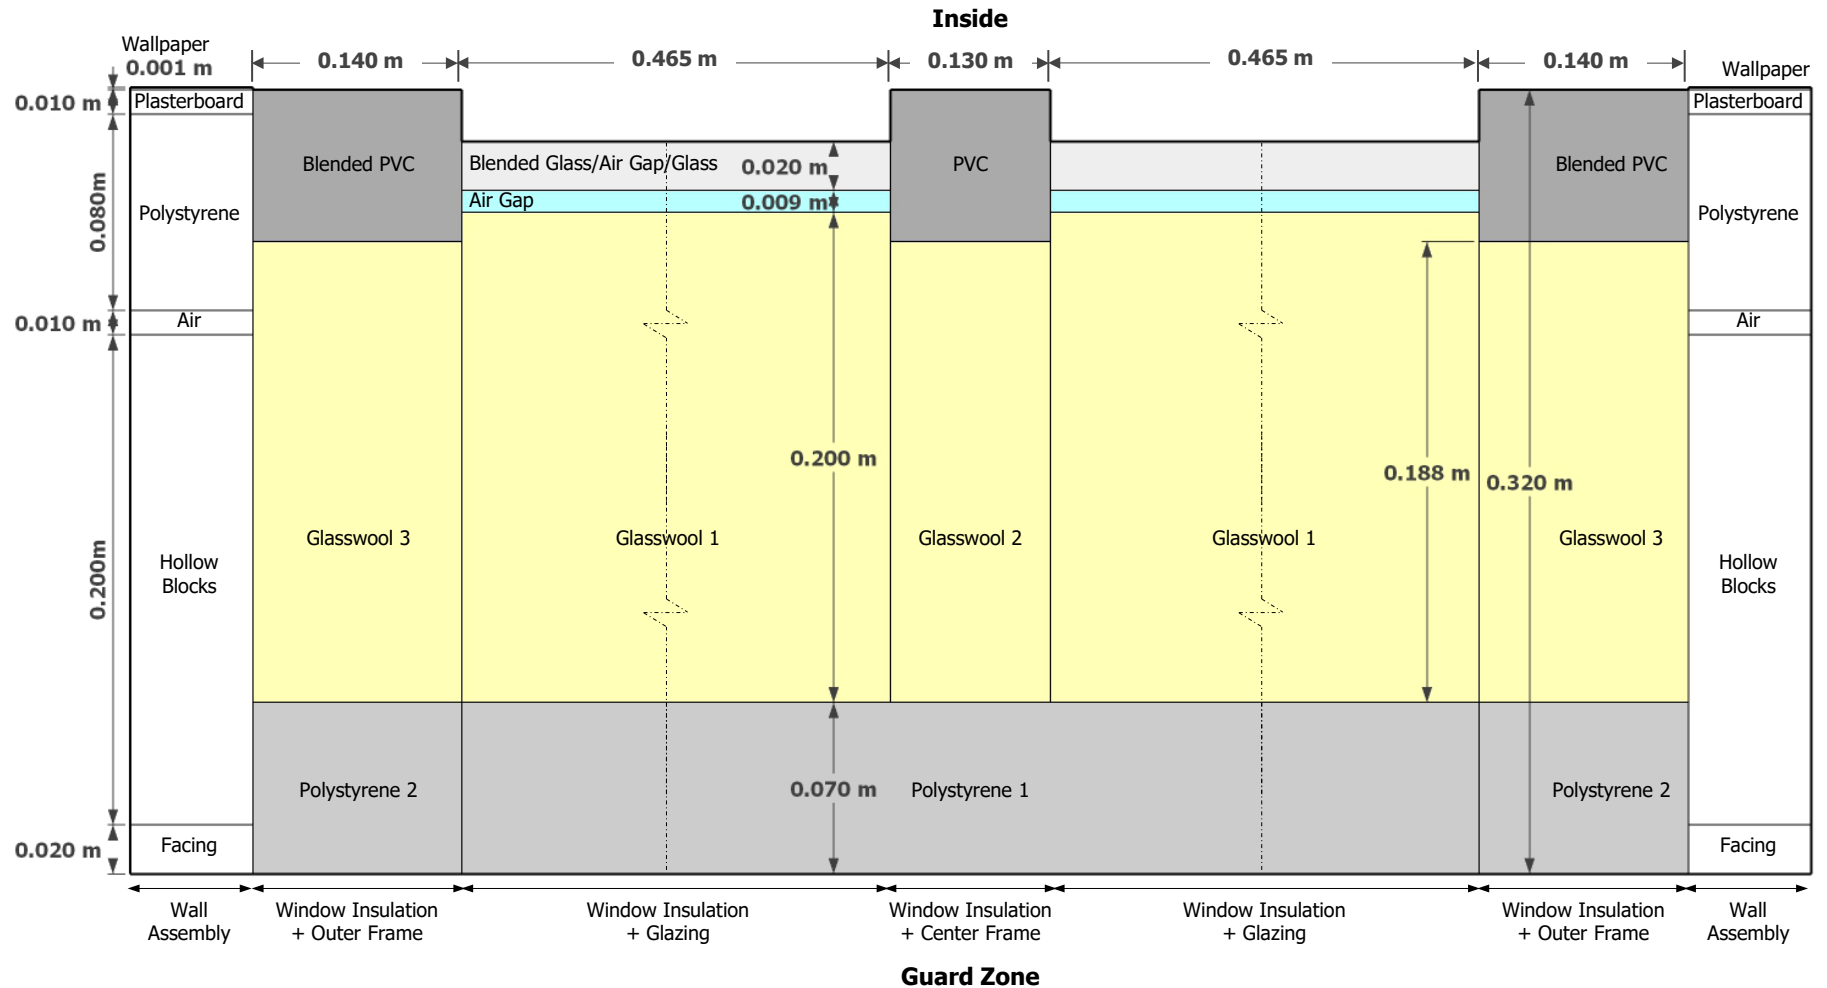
Window Vertical Section (window and frame assembly), through the window and external setback cavity looking downward (or upward) – NOT TO SCALE
